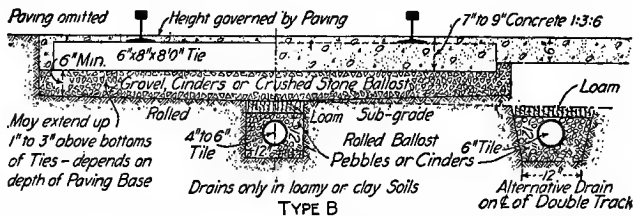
TYPE B—BALLASTED TRACK CONSTRUCTION RECOMMENDED BY THE AMERICAN ELECTRIC RAILWAY ENGINEERING ASSOCIATION
